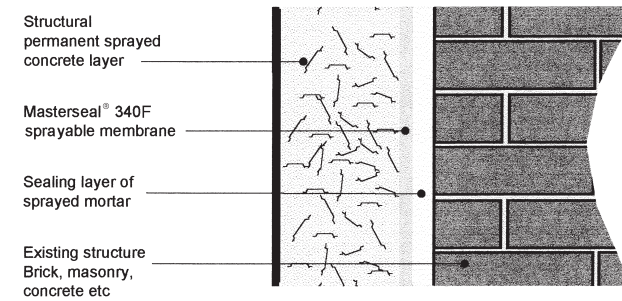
Masterseal® 340F applied to an existing structure as an element of rehabilitation works
